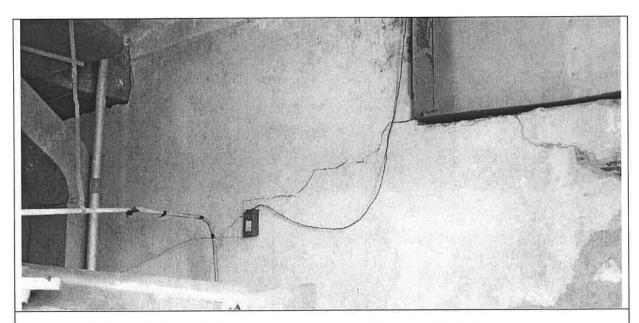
East End of Interior Bearing Wall below South Gable: Note significant structural cracks,
